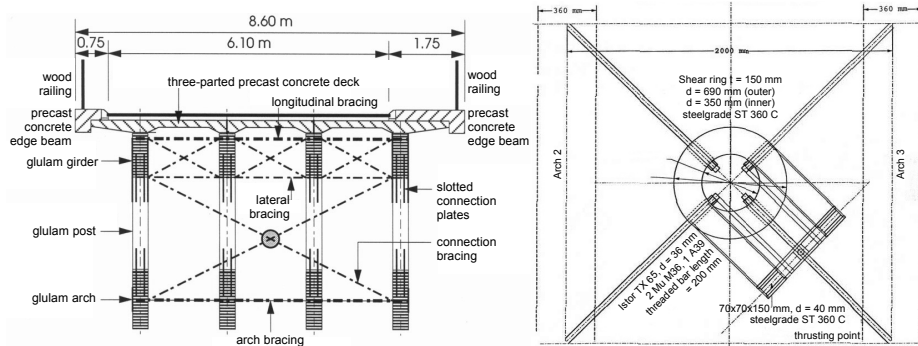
Bridge cross section (left); Connection detail for diagonal connection bracing (right).
